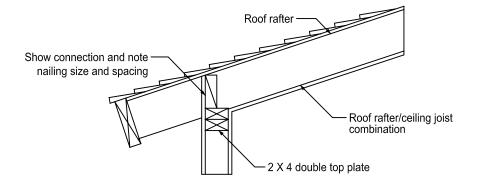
Detail B / Typical Roof Connection, Load Bearing Ridge Beam
